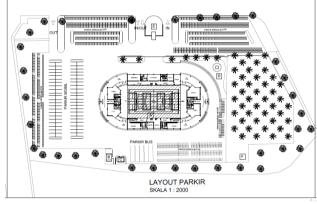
New Sport Center Kepanjen Parking Layout Plan
